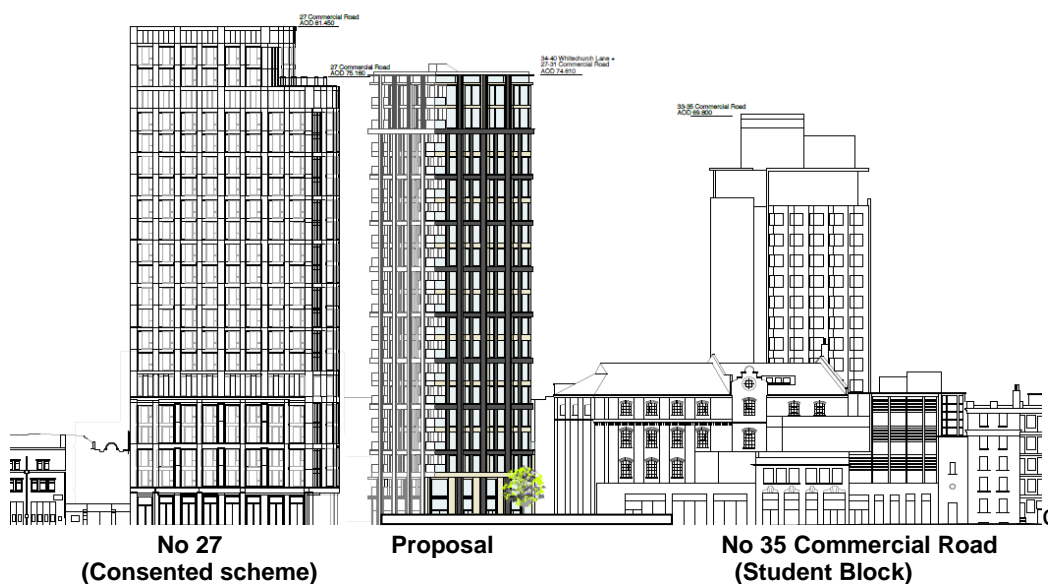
Scheme in relation to surrounding consented tall buildings at No.27 and No. 35 Commercial Road
